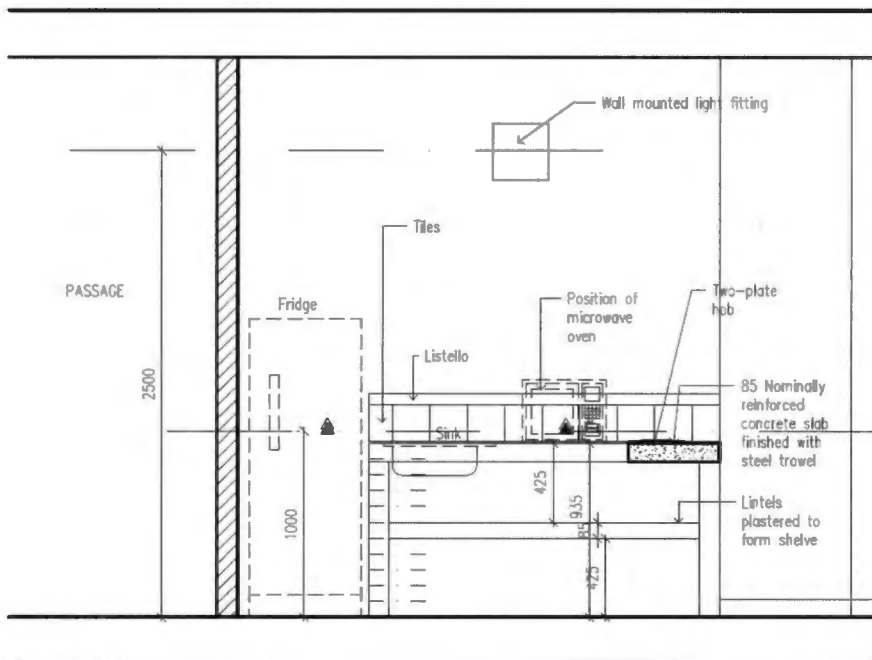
Detail side view layout of kitchen for Building A apartment units
